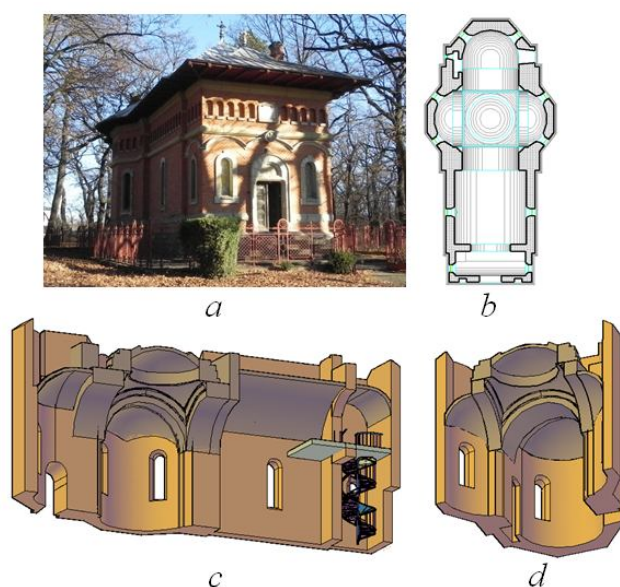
The “Three Hierarchs” Chapel: *a* – main facade; *b* – the plan of the walls; *c* – longitudinal section; *d* – transversal section.
